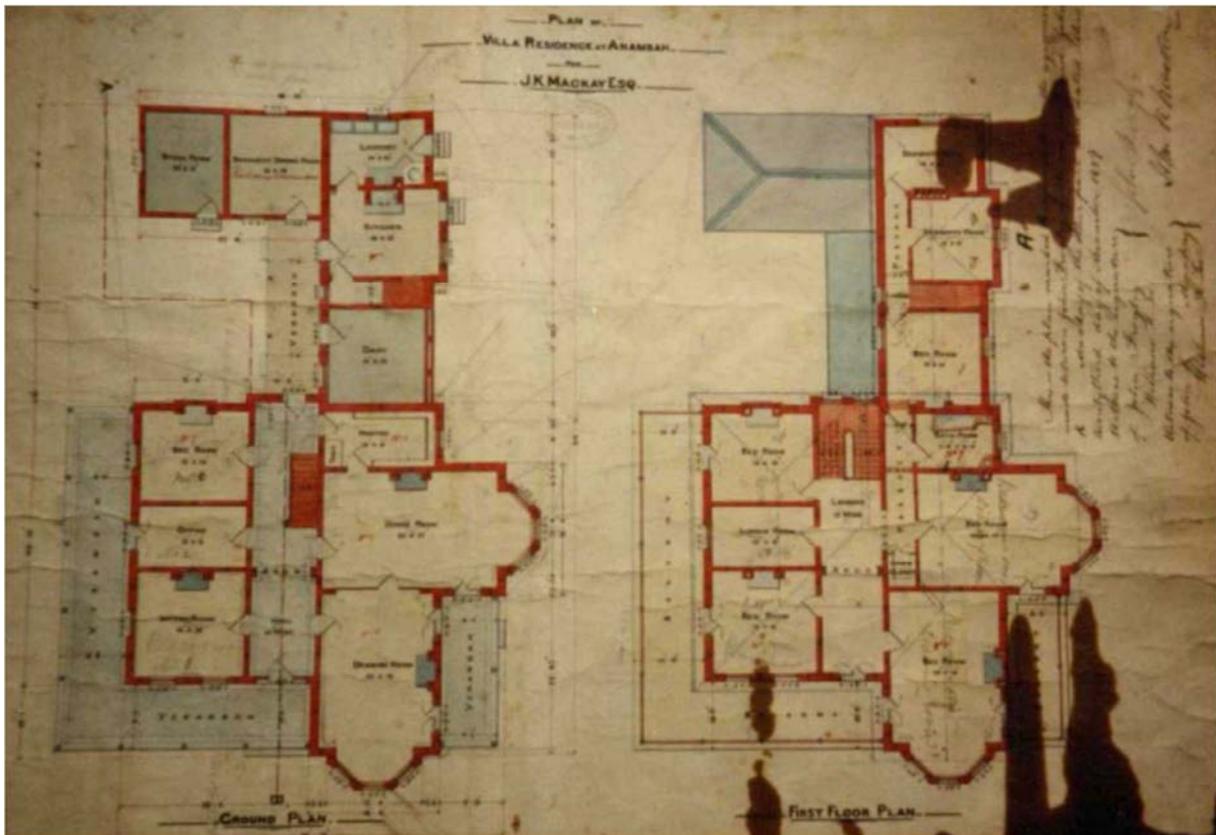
Plans for Anambah homestead, showing windows and balconies positioned for views to the south, east and north and servant's quarters to the west.
